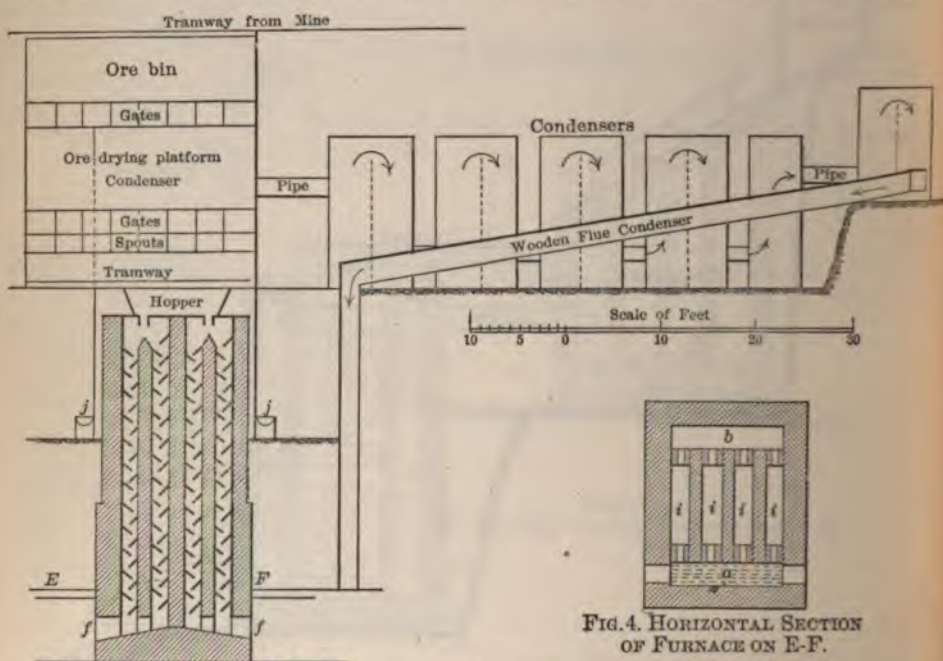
VERTICAL SECTION OF FURNACE ON C-D. AND ELEVATION SHOWING CONDENSERS.
